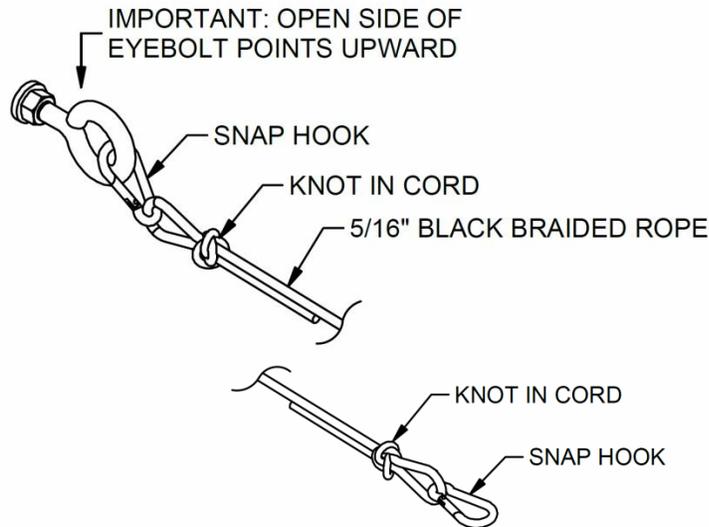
Standard Building Attachment - For Solid Concrete Walls
